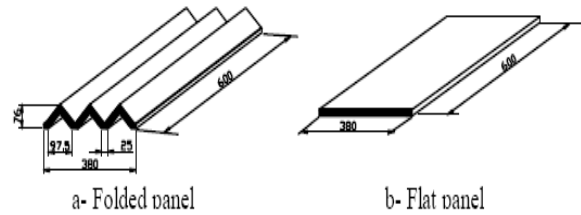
Dimensions of the folded and flat panels (dimensions are in mm).
